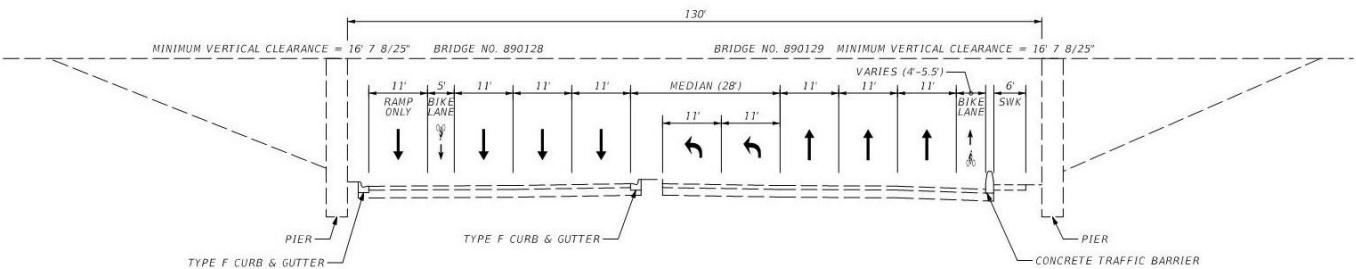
| Typical Section-SR 76 / Kanner Highway between west of SW Jack James Drive and SR 9 / I-95
